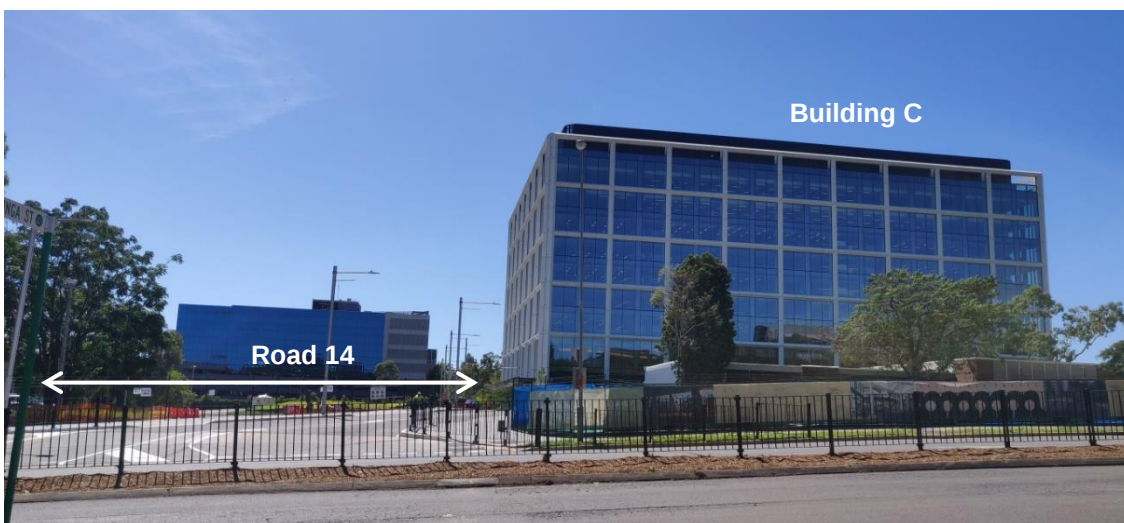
View of south-eastern portion of site from Waterloo Road. The subject site is located in front of Building C. The trees on the site have been removed as part of a Tree Management Permit.
